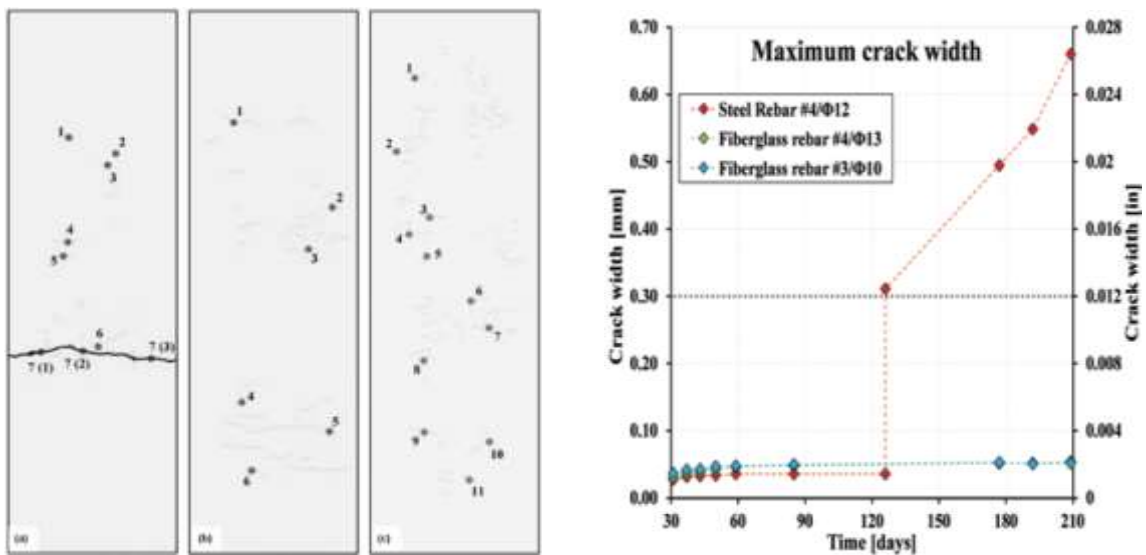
Indoor Slab Crack Pattern (A) No.4 Steel Rebar (B) No.4 GFRP Rebar (C) No.3 GFRP Rebar Slab (Barragan et al., 2023)
